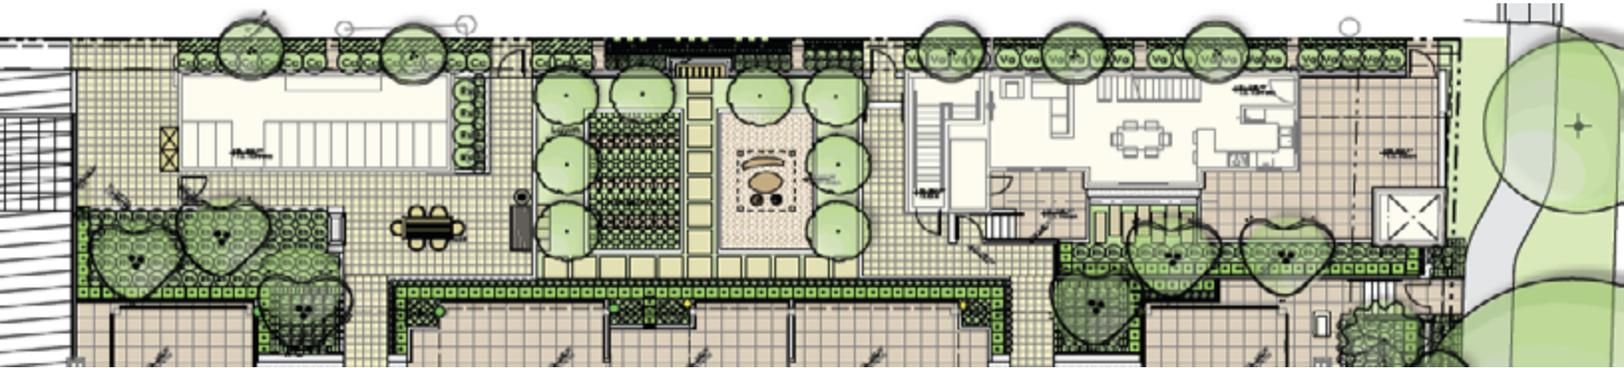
| Landscaping program for amenity space provided behind the buildings
